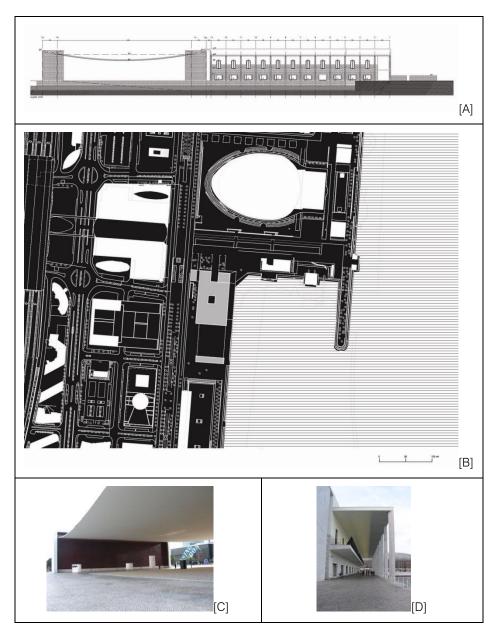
Pavilion of Portugal; [A] South elevation; [B] location plan: public space(black) case-study (grey); [C]view of the covered square; [D] South gallery
